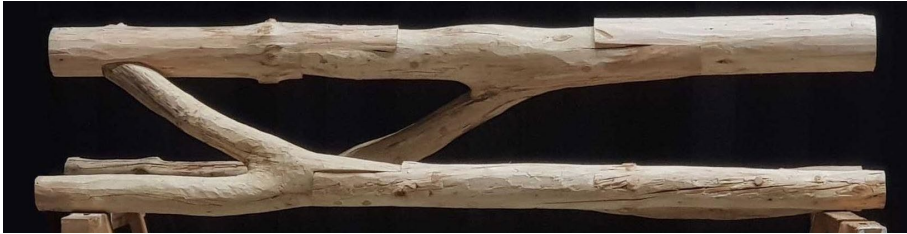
Assembly of the prototype using three tree forks and four straight segments.
